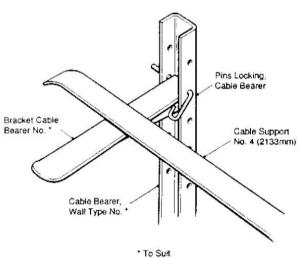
(a) & (b) (below) - Cable Bearer, Wall Type Assembly
